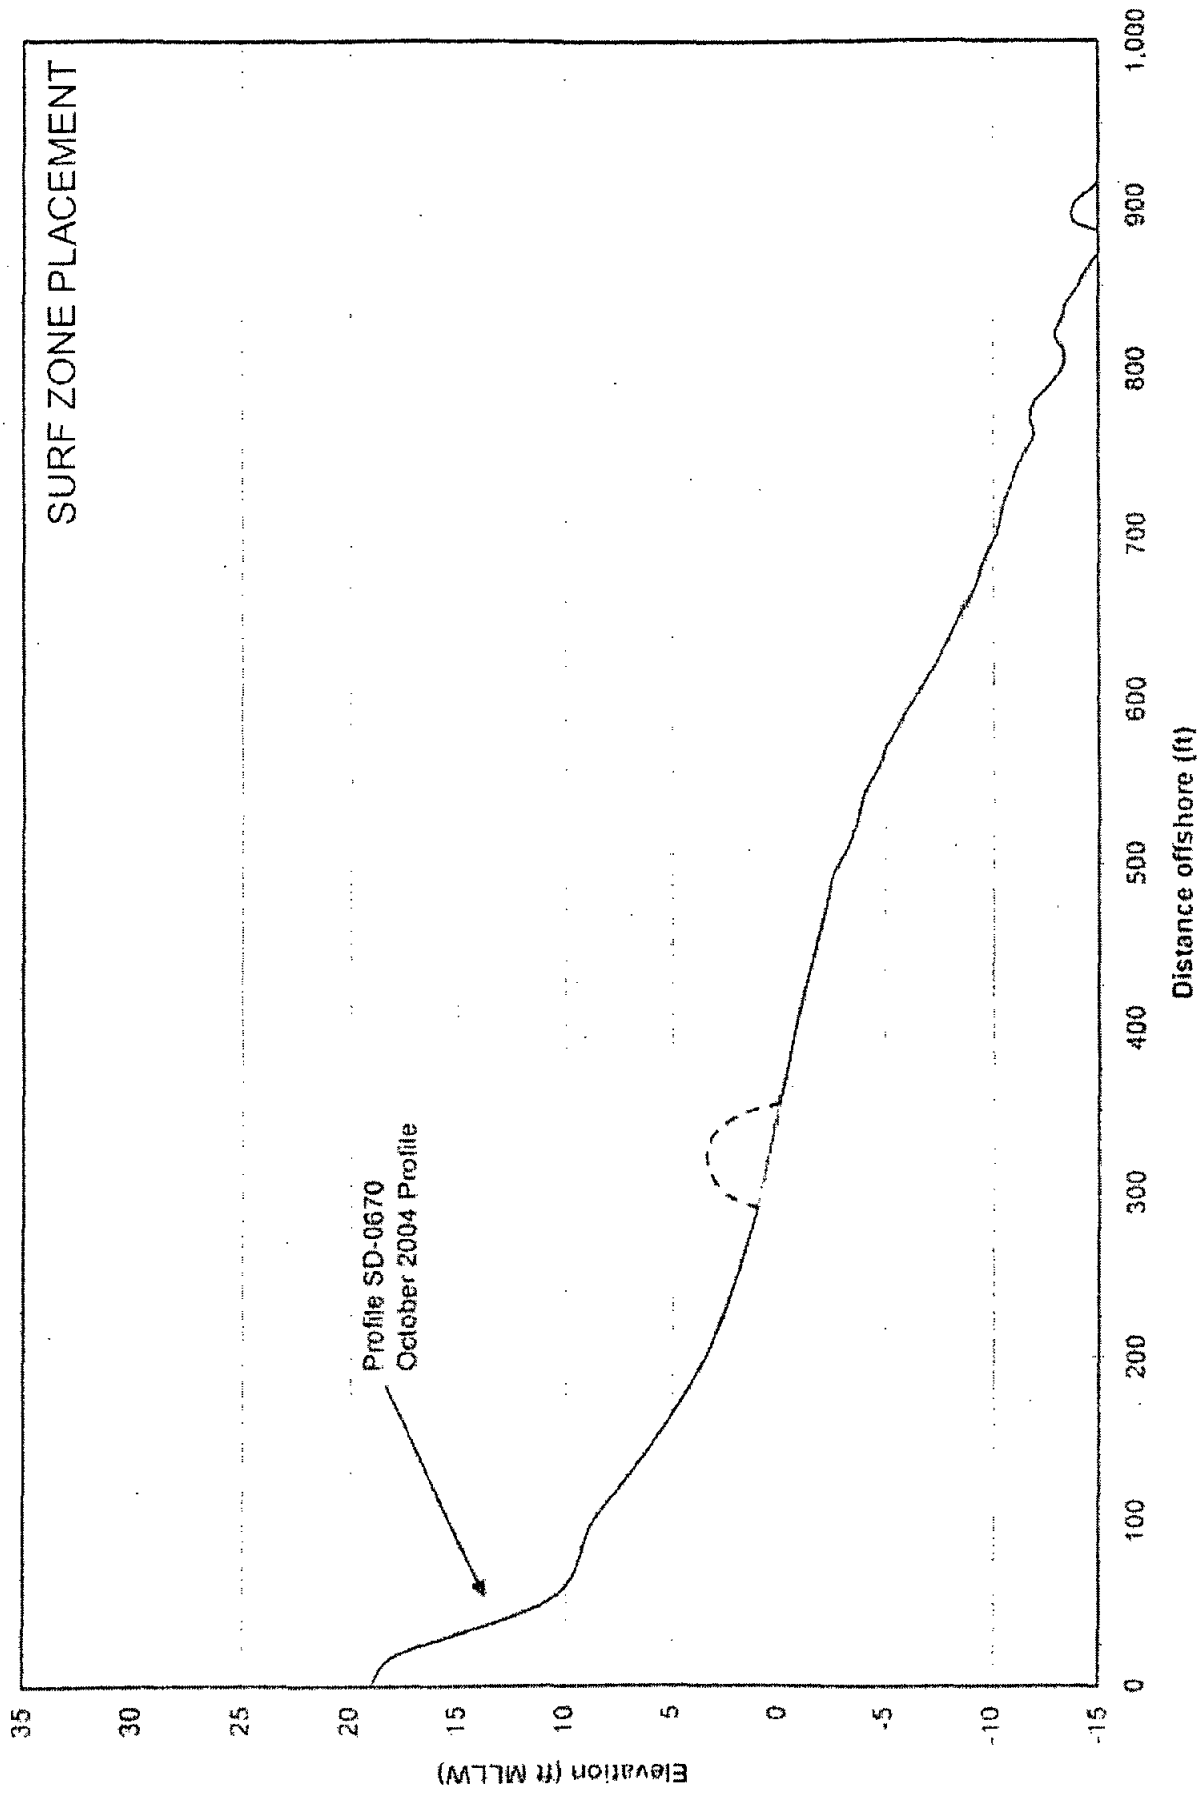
Moonlight Beach Typical Cross Section - Surf Zone Placement
